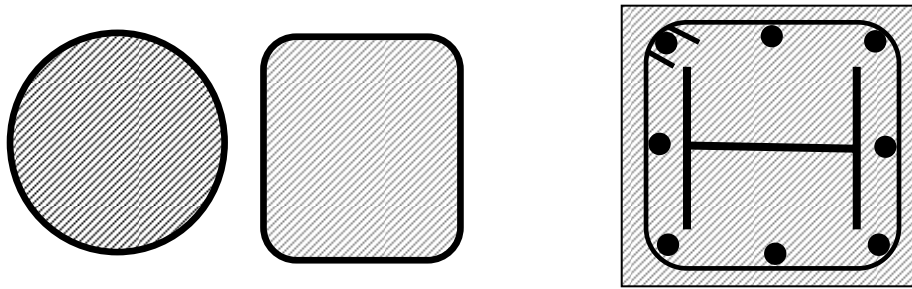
Concrete-filled tubes (left) and fully encased composite column (right)
